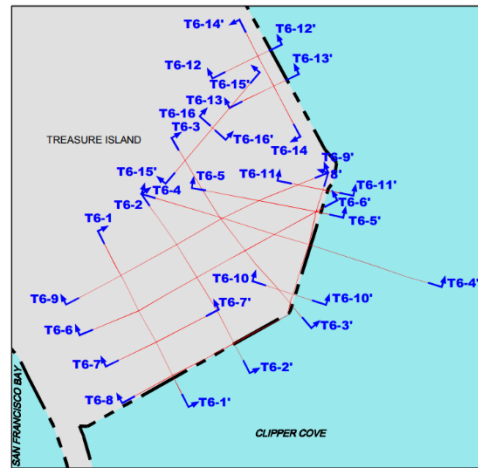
Section location plan for cross-section views (ENGEO Inc., 2019)
